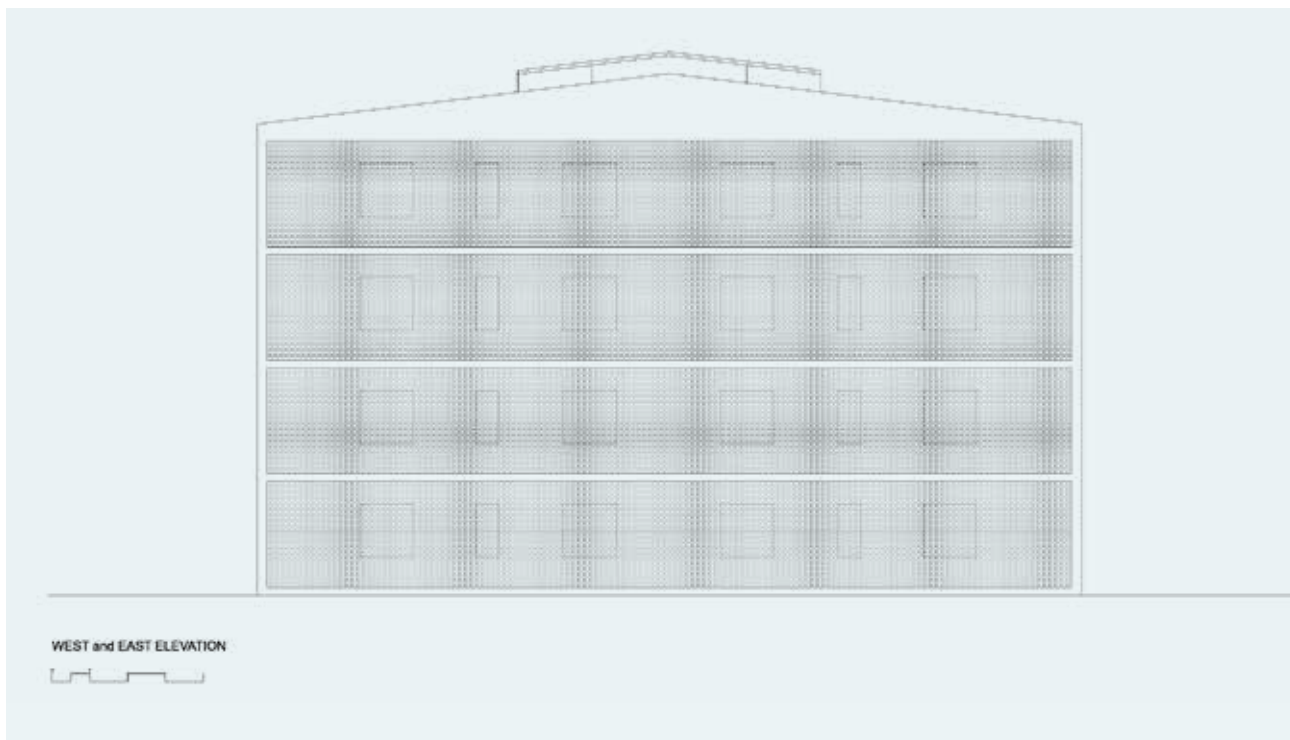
IMPROVED MULTI-STOREY RESIDENTIAL BUILDING (WEST AND EAST ELEVATIONS)
